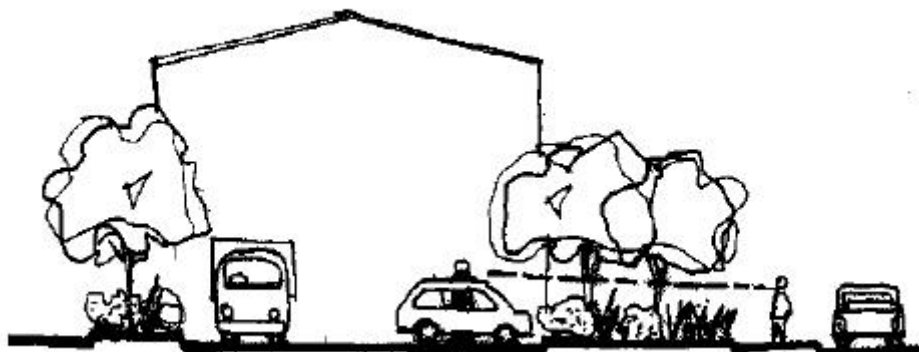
Landscape planting in carparks to provide shade and to maximise visibility.
